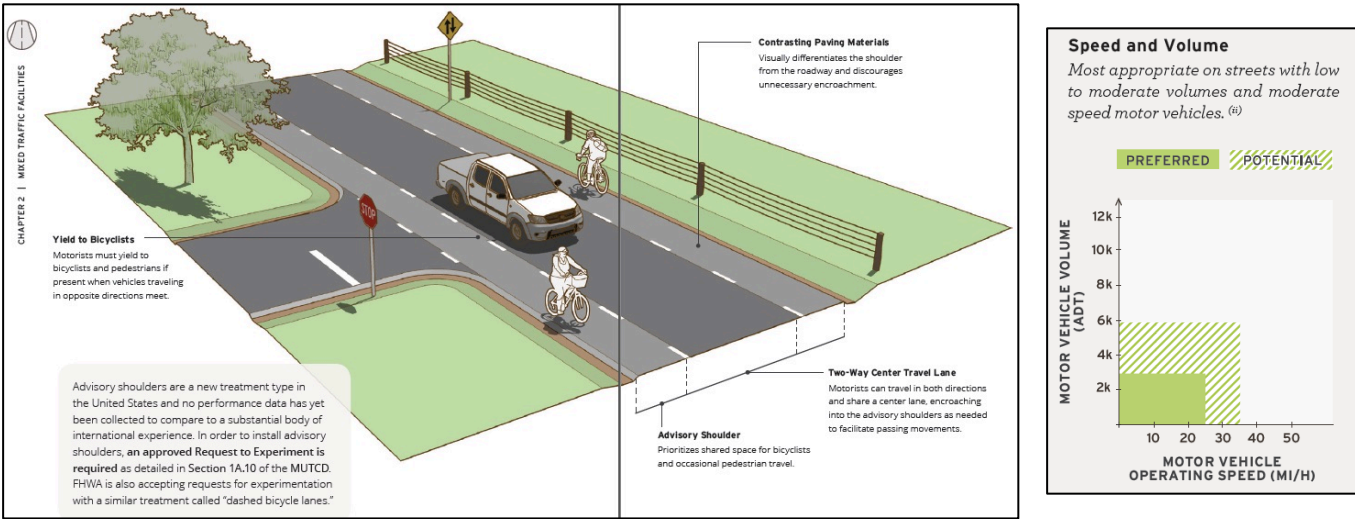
Edge Lane Road elements (FHWA Small Town and Rural guide)
